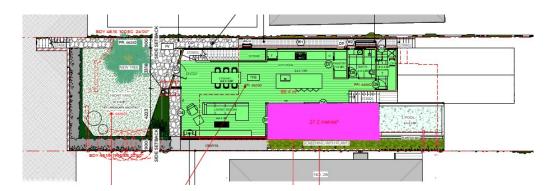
Previously approved gross floor area under DA2020/1784 shown in green - ground floor.
